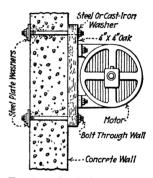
A suitable method of mounting a motor on a concrete or brick wall.
